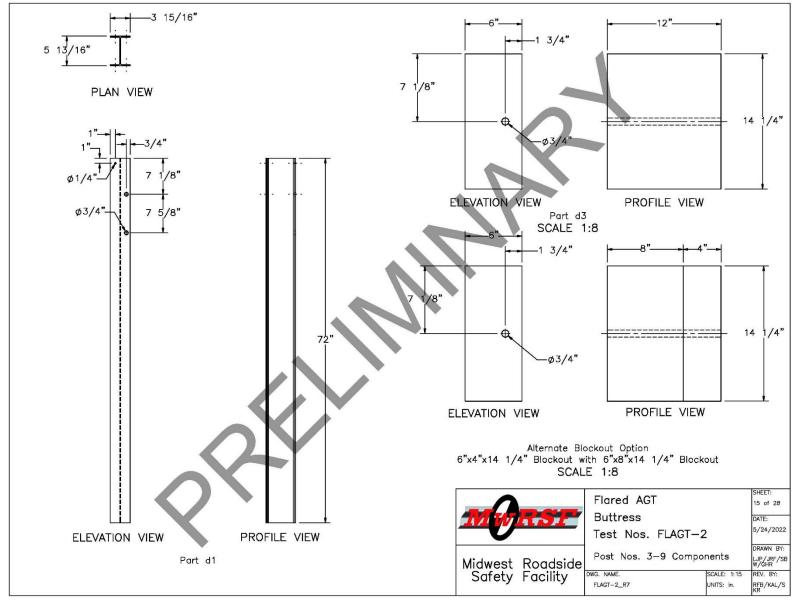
Post Nos. 3 through 9 Components, Test No. FLAGT-2
